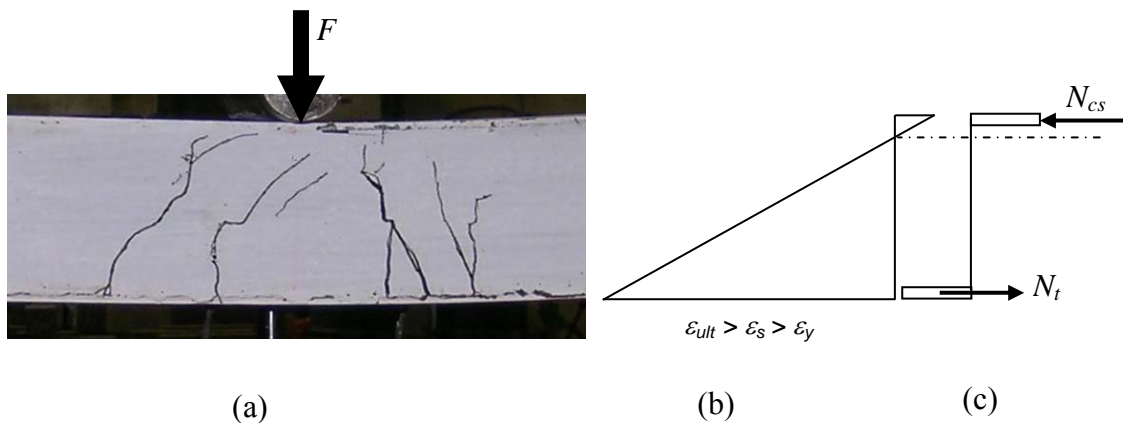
Cracks developed in SCS sandwich test beam at failure: (a) cracking in the concrete core at failure; (b) strain in the section; (c) stress distribution
